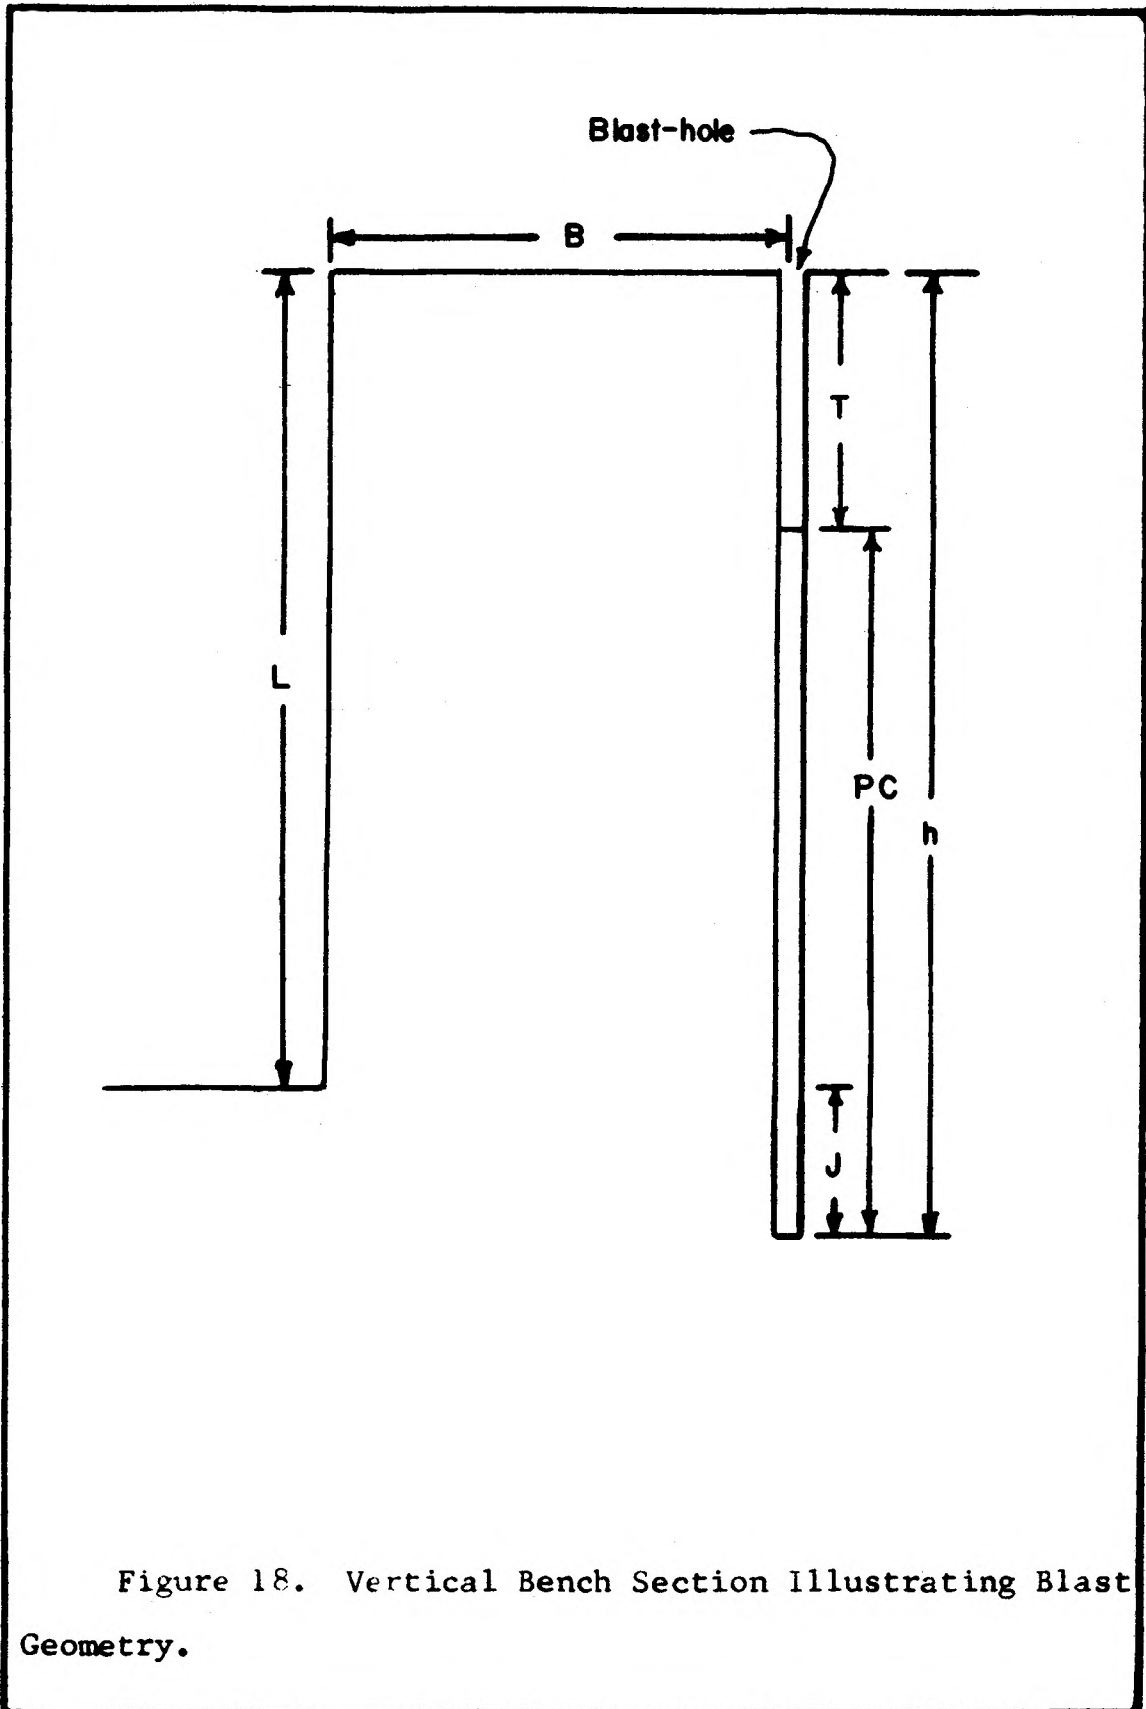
Vertical Bench Section Illustrating Blast Geometry.
